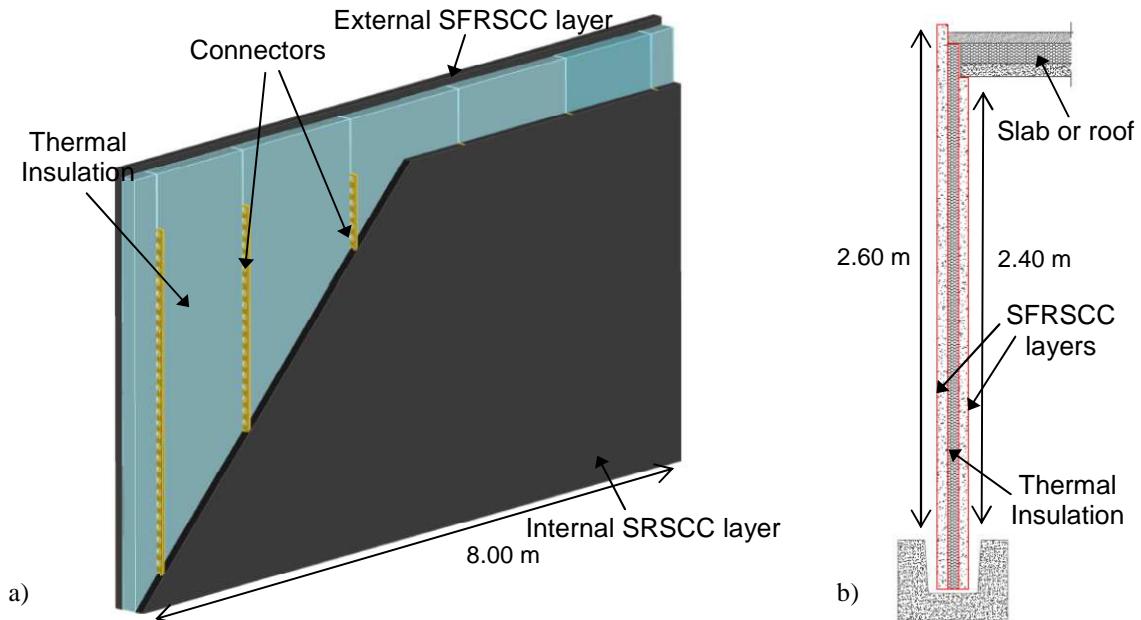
Proposed building system: a) components of the devised load-bearing sandwich wall panel; b) cross-section
